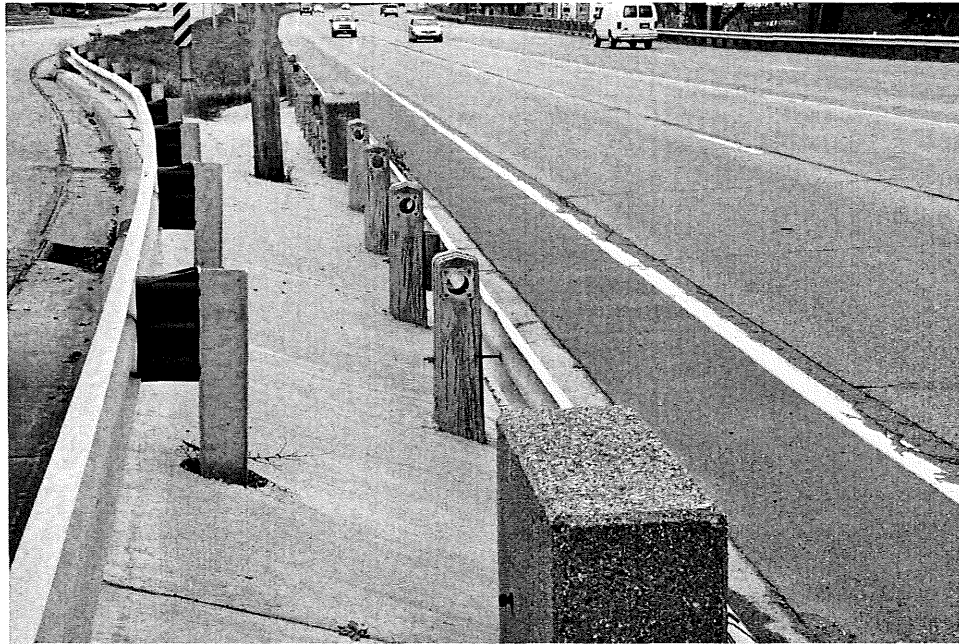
Highway 61. Highway 61, Red Wing Segment, Subsection 3, 1953 railing remnant on southbound lane at Washington Street (facing W)
